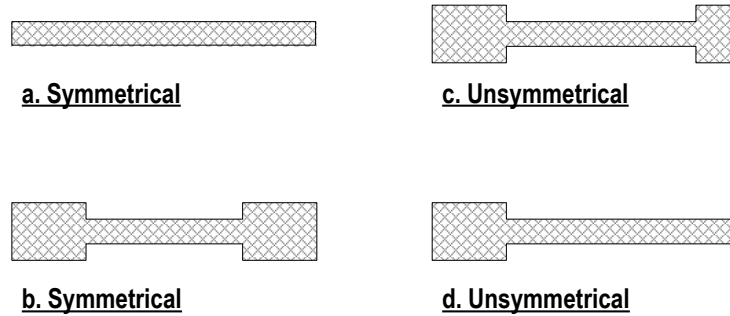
Example Plan Views of Symmetrical and Unsymmetrical Wall Piers
